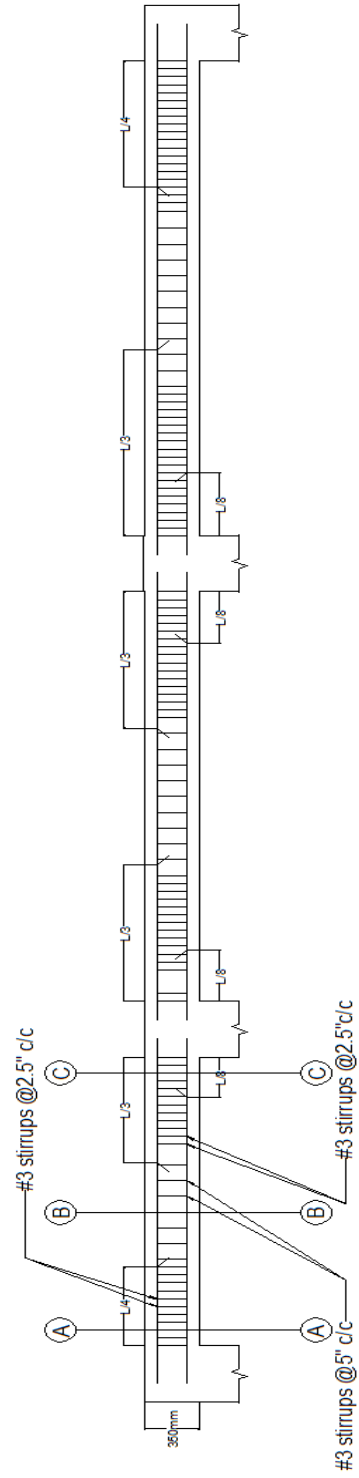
Beam rod detailing for X-axis ROOF
